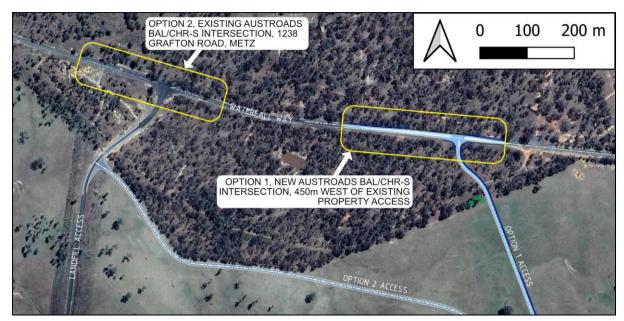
Proposed Alternate Locations for New Property Access to Waterfall Way
